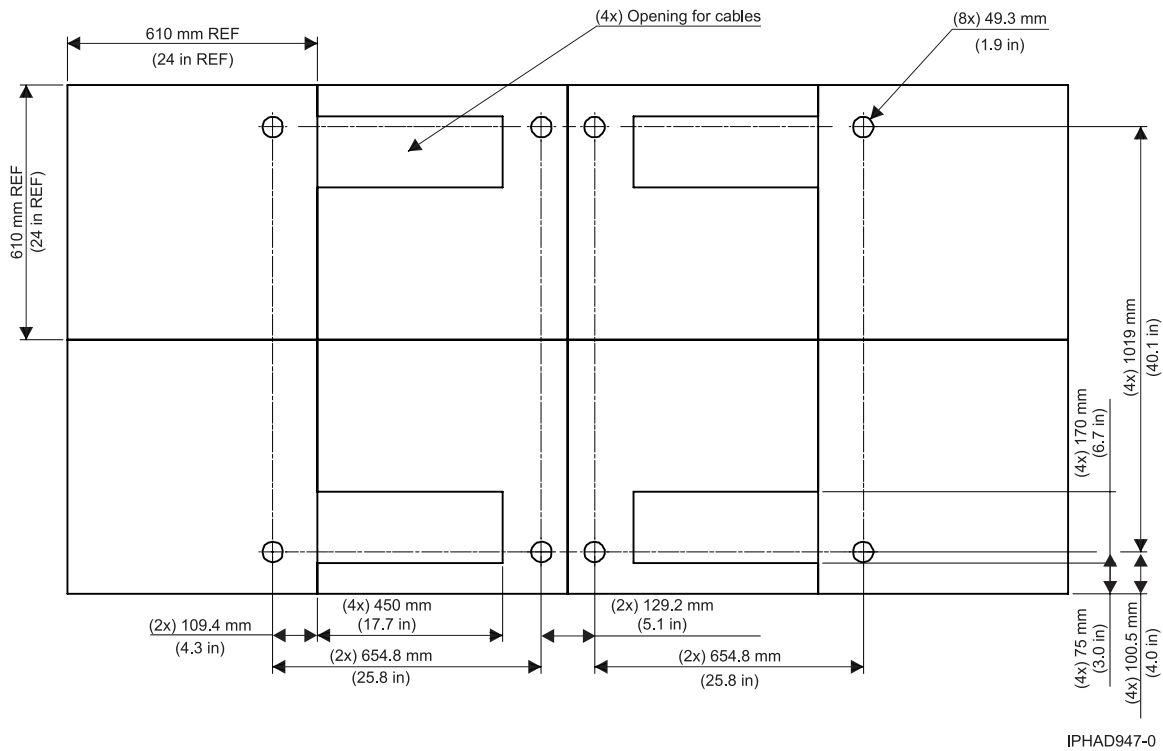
Eyebolt positioning for 610 mm (24 in.) floor tile layout
